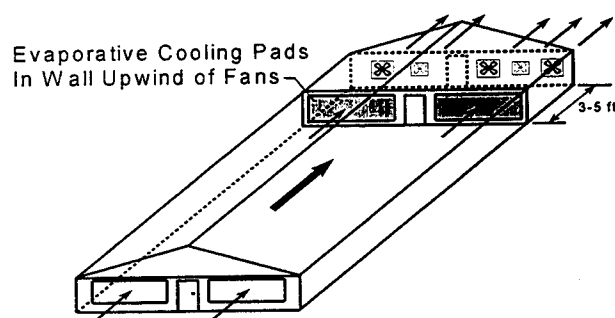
Evaporative cooling pad installed as a wet scrubber in a tunnel-ventilated swine building.
